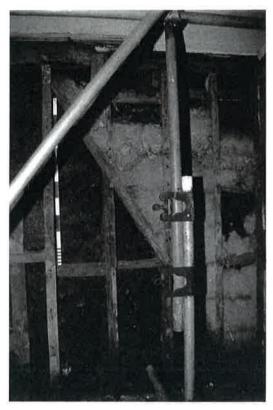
Detail of the north (internal) face of the phase I south wall of room P after removal of secondary boarding. Note the sawdust insulation, the internal face of the phase I exterior wall panels and primary window, blocked with reused phase I panels, on left
